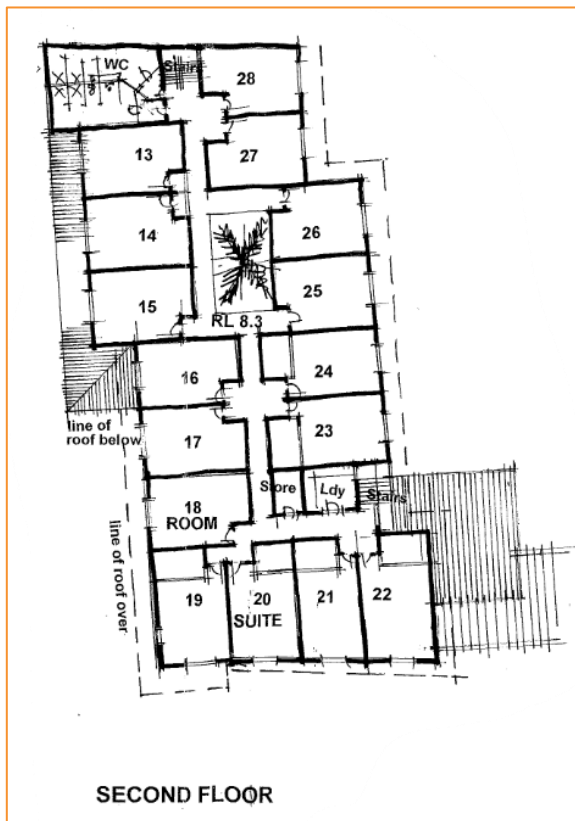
Extract of Existing Approved 2nd Floor Source: Appeal No. 1 of 2001
